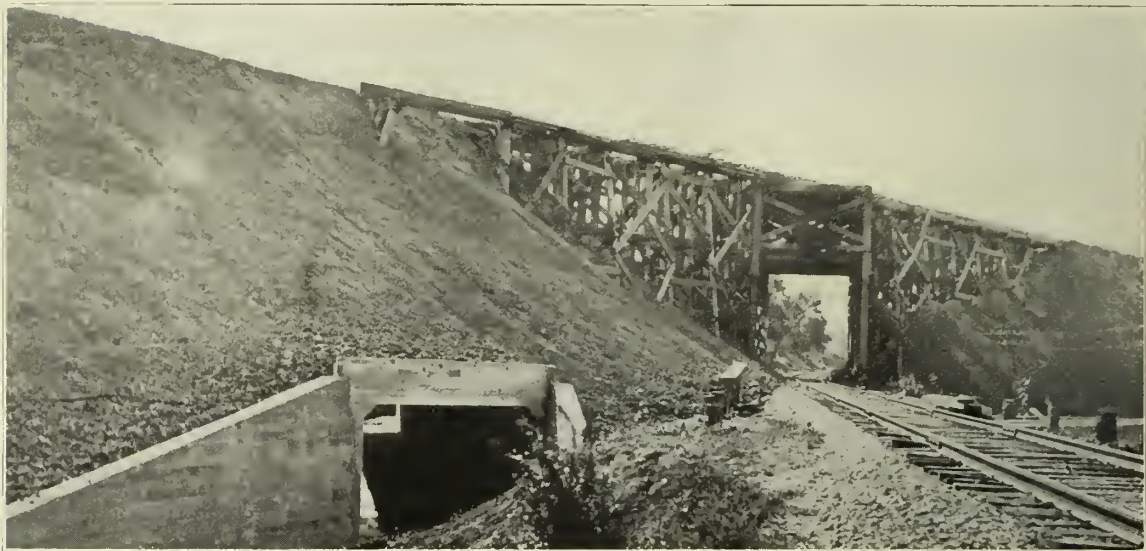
Temporary Trestle for Crossing Over Old Main Line; 15x12-ft. Concrete Culvert for Waterway and for Farmer's Private Use.
